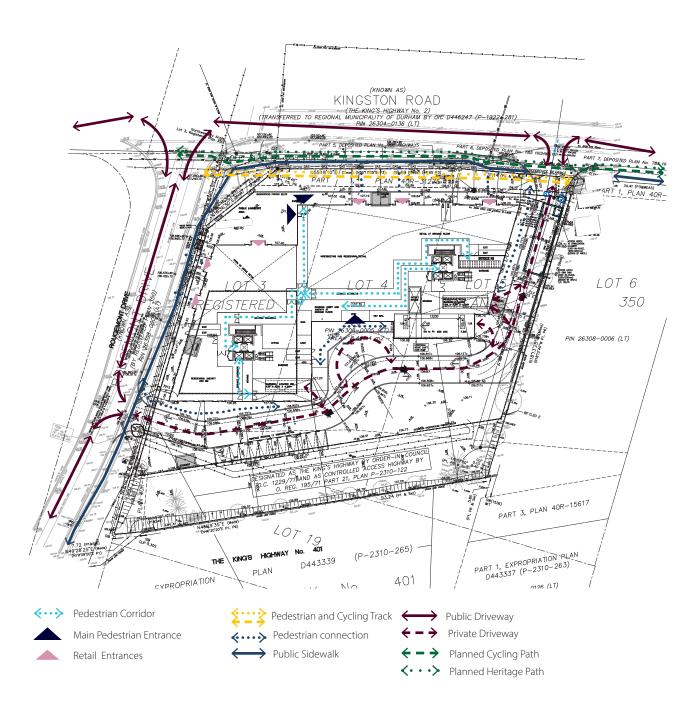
Ground floor plan showing proposed pedestrian and vehicular circulation in relation to planned Cycling Track and Heritage Path.
